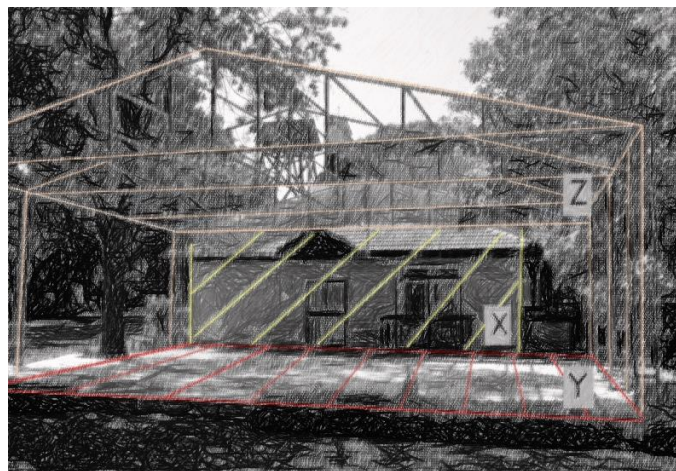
Sketch of building elements in X, Y, and Z planes (Salihoğlu, 2019).
